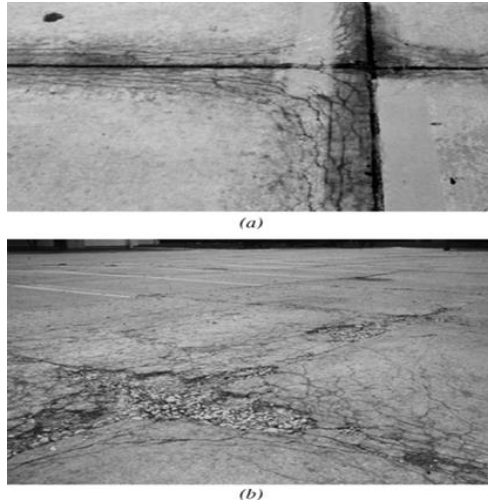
Cracks: (a) fine; and (b) severe, with spallation present (ACI 201.1R-08)
